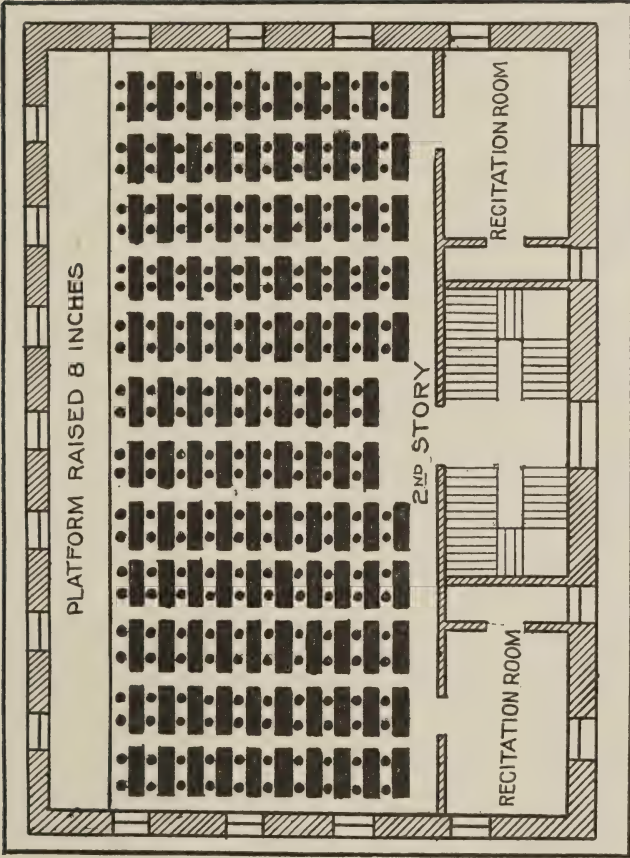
Second-floor plan of Brimmer Grammar School, Boston, 1843.
